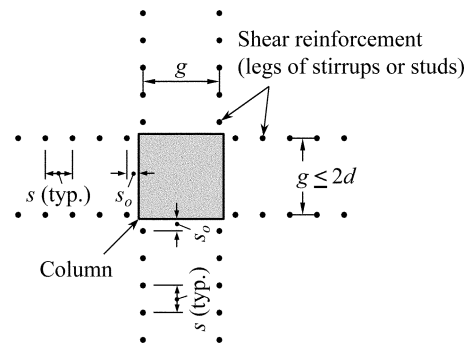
Top view of flat plate showing arrangement of shear reinforcement in vicinity of interior column.
